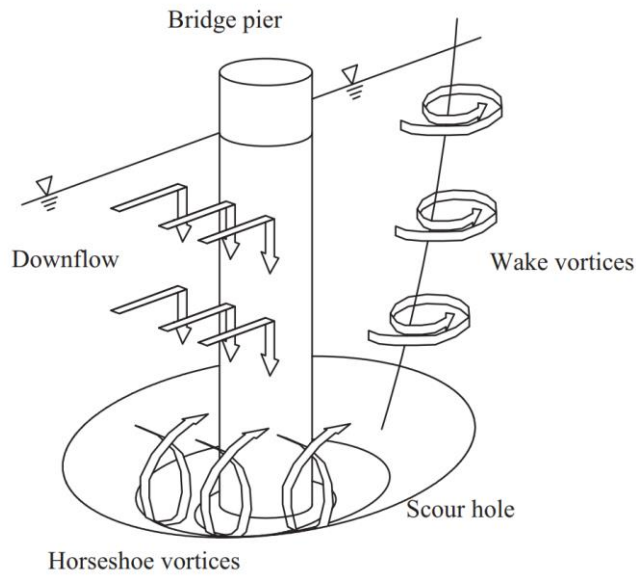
Flow around a single pier (Prendergast and Gavin, 2014)
